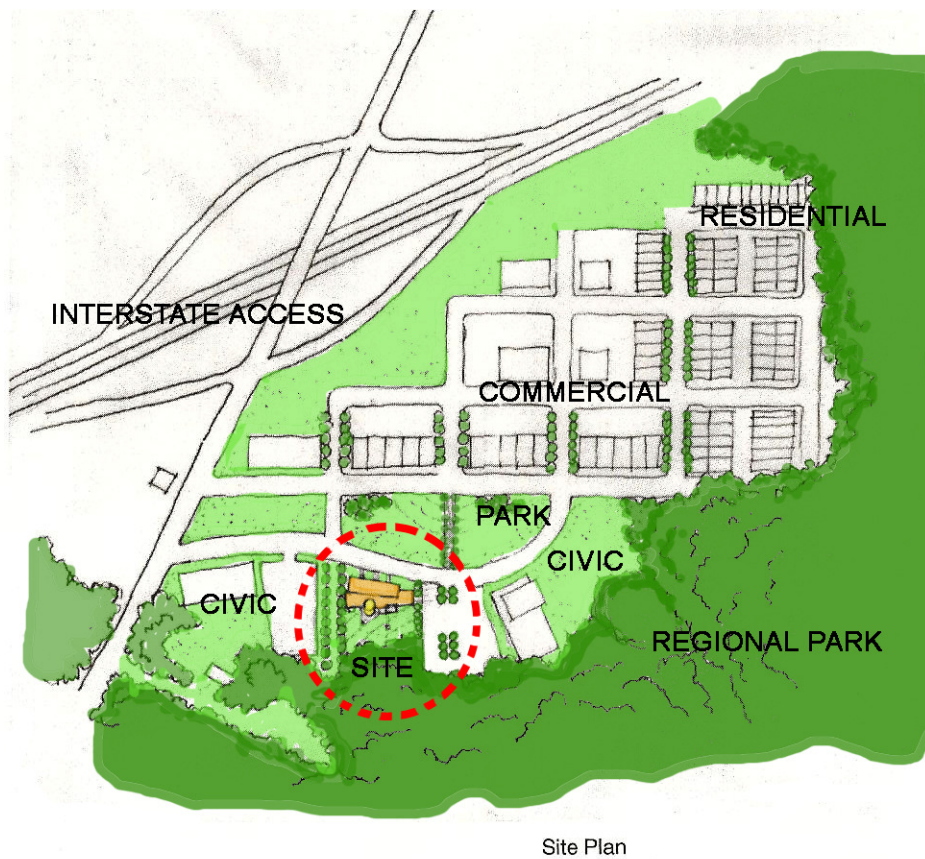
Site plan identifying site within proposed city center at Lino Lakes, MN.⁷
